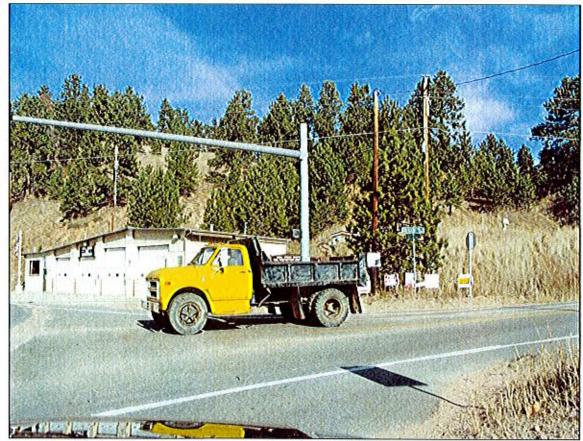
MP 18.0 Crescent Park Drive & Highway 72 intersection
